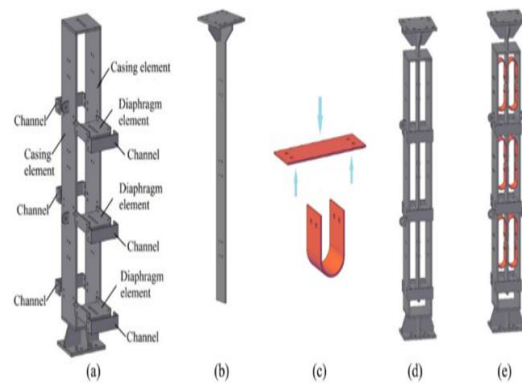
damper illustration a. casing and diaphragm elements b. piston element c. U-shaped steel plates' cold rolling process d. the damper before placing the U-shaped steel plates e. the damper after installing the U-shaped steel plates
